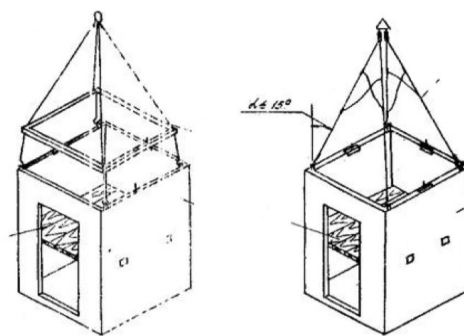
Elevator shaft slinging (TFC 6307030131/41131 1991)
